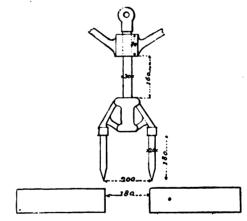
DETAIL OF BREAKING NEEDLES.
